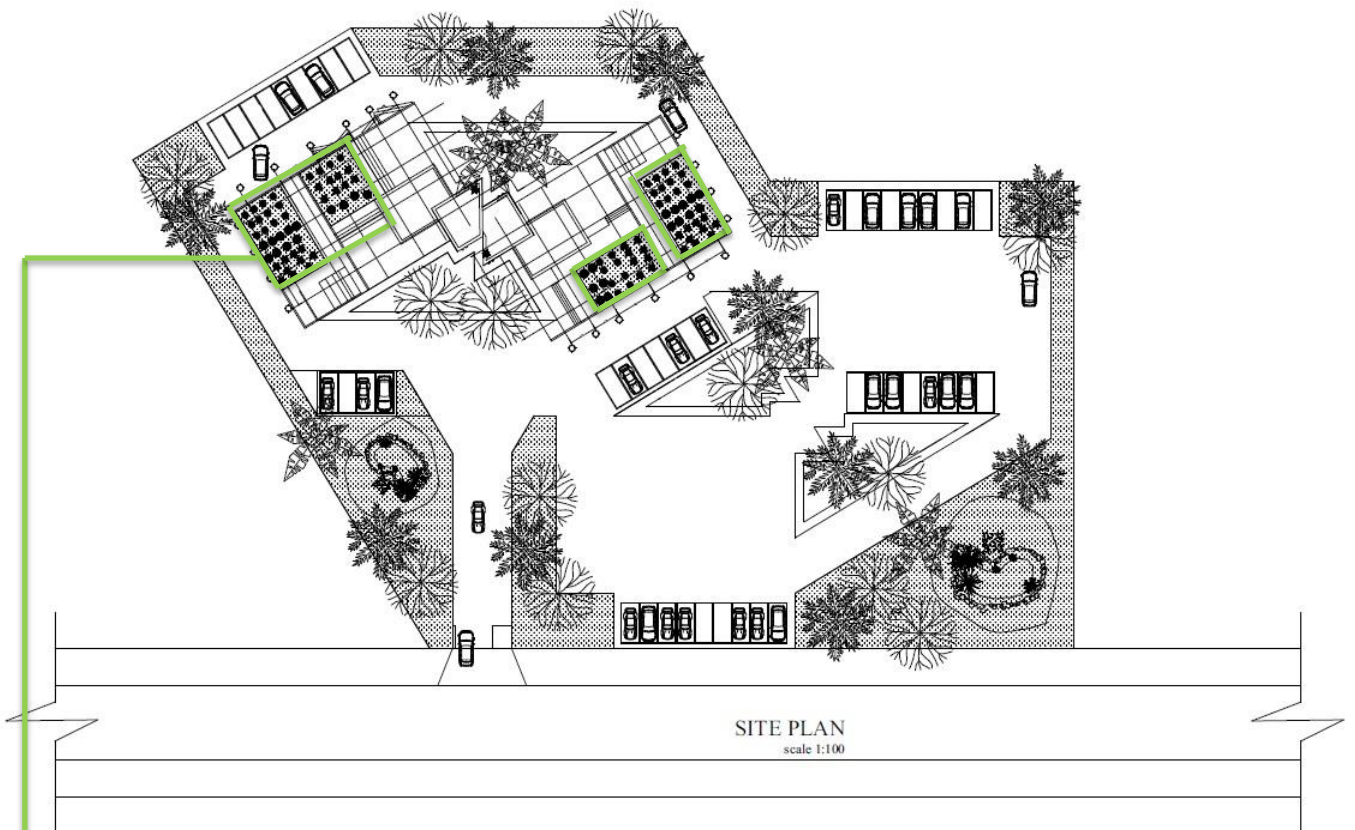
Figure 6.16 Greenery locations on building terrace and rooftop
